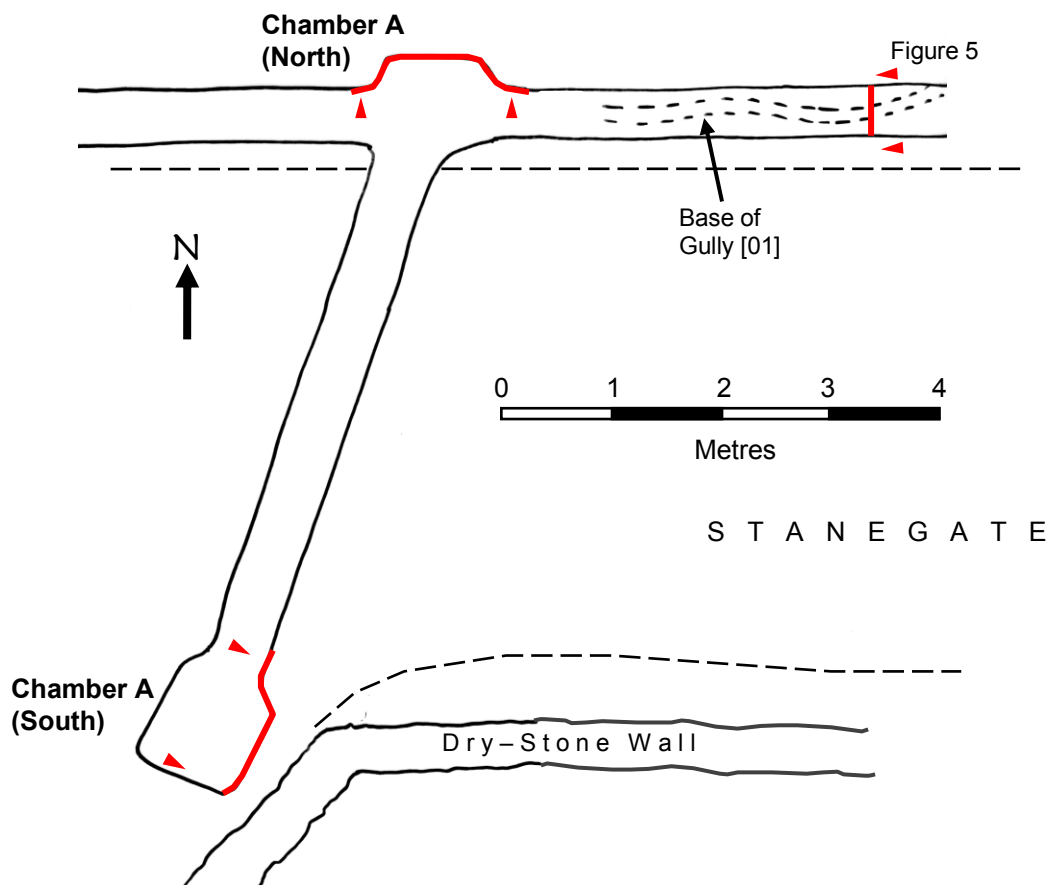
Schematic plan showing western end of the drainage run with Chambers A north and south, showing location of section across the drainage pipe trench (figure 5) and sections of chambers (figure 7) marked in red.
